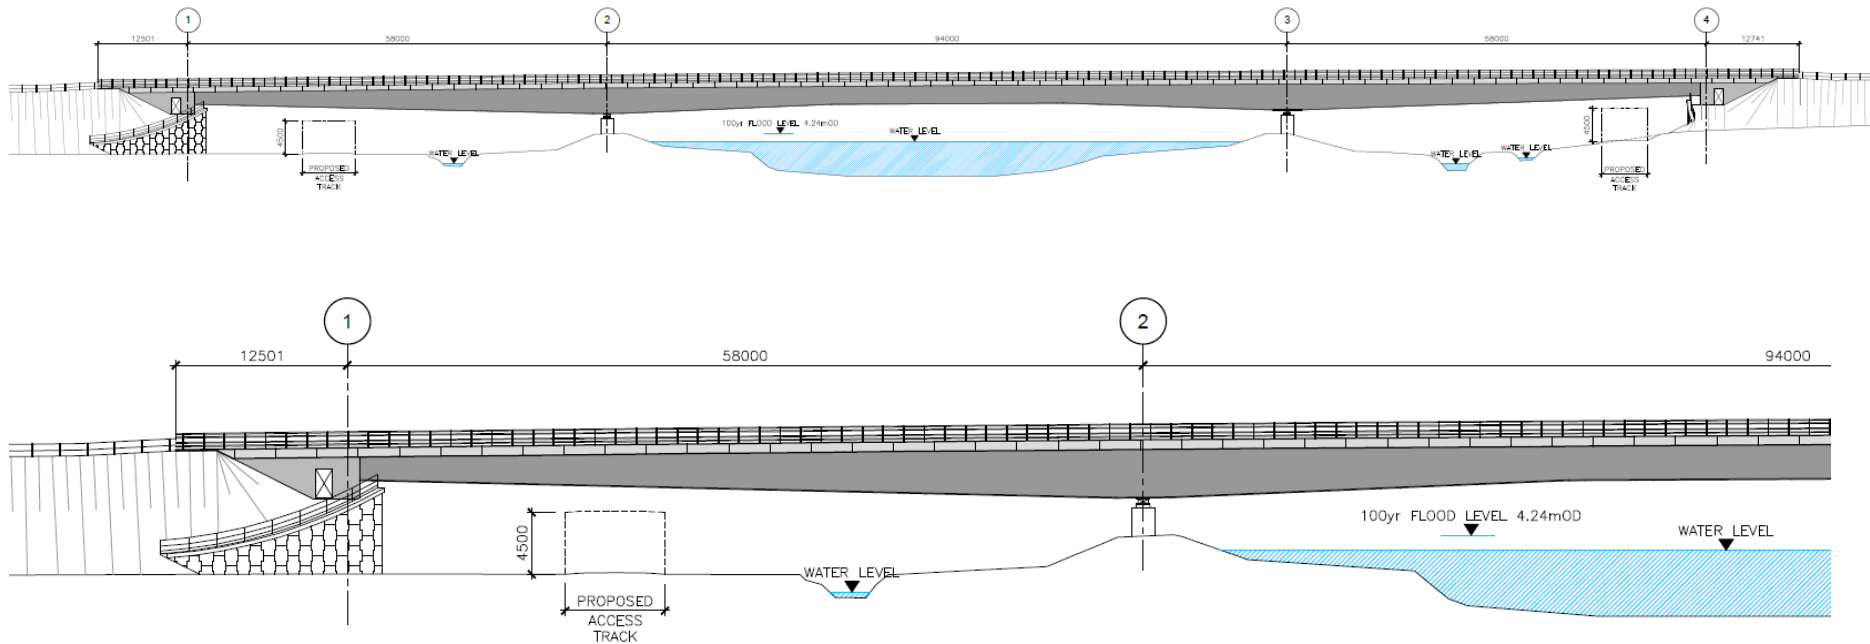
Proposed River Mague Bridge (RVB04) – Full bridge at top and enlargement of Half Span below
